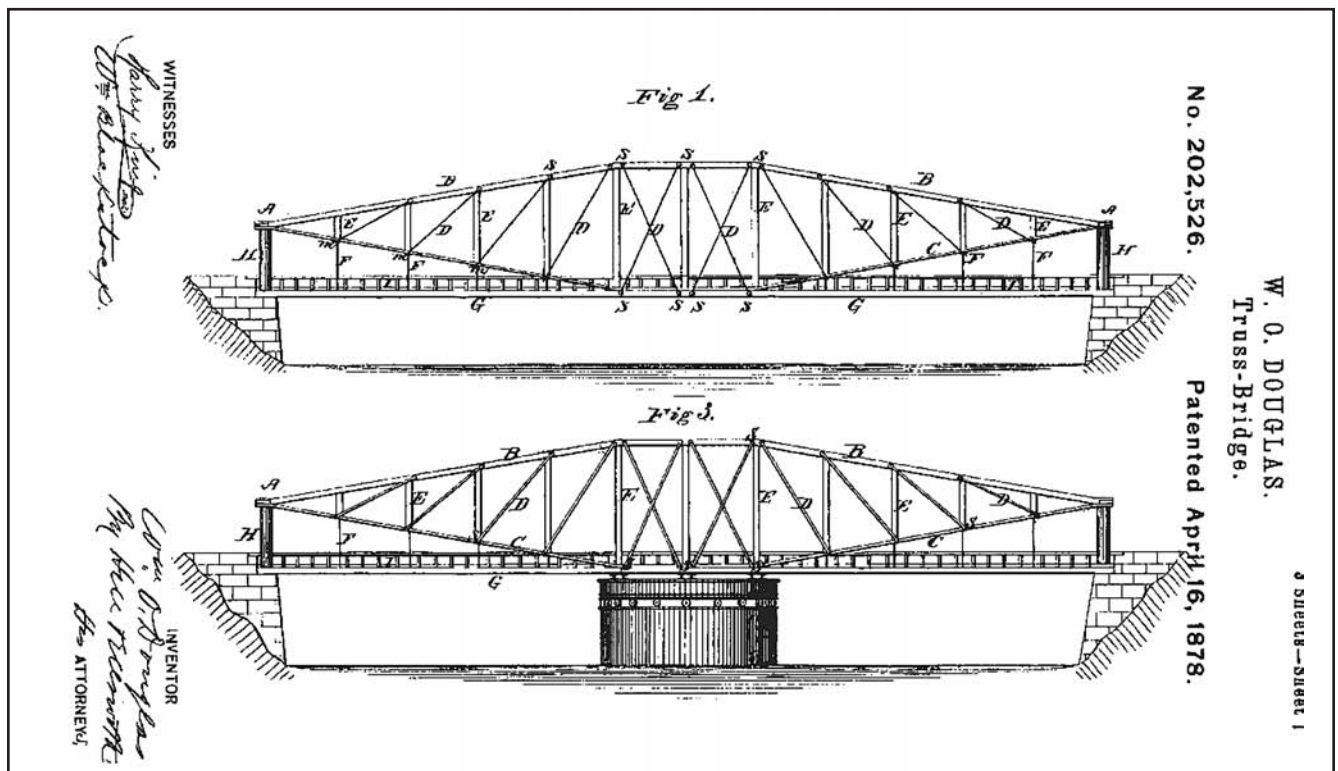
Elevations for a truss bridge and a swing span. William O. Douglas, "Improvement in Truss-Bridges," Patent no. 202,526, filed 28 Mar. 1878, issued 16 Apr. 1878.
